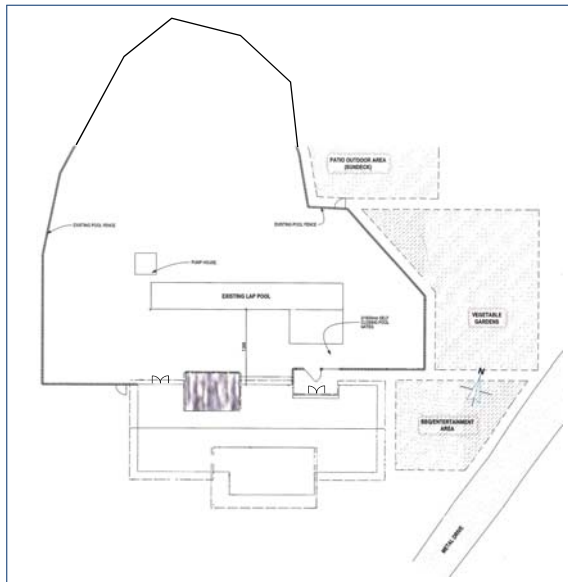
Site plan of proposed dwelling and the existing pool (Not to scale)
